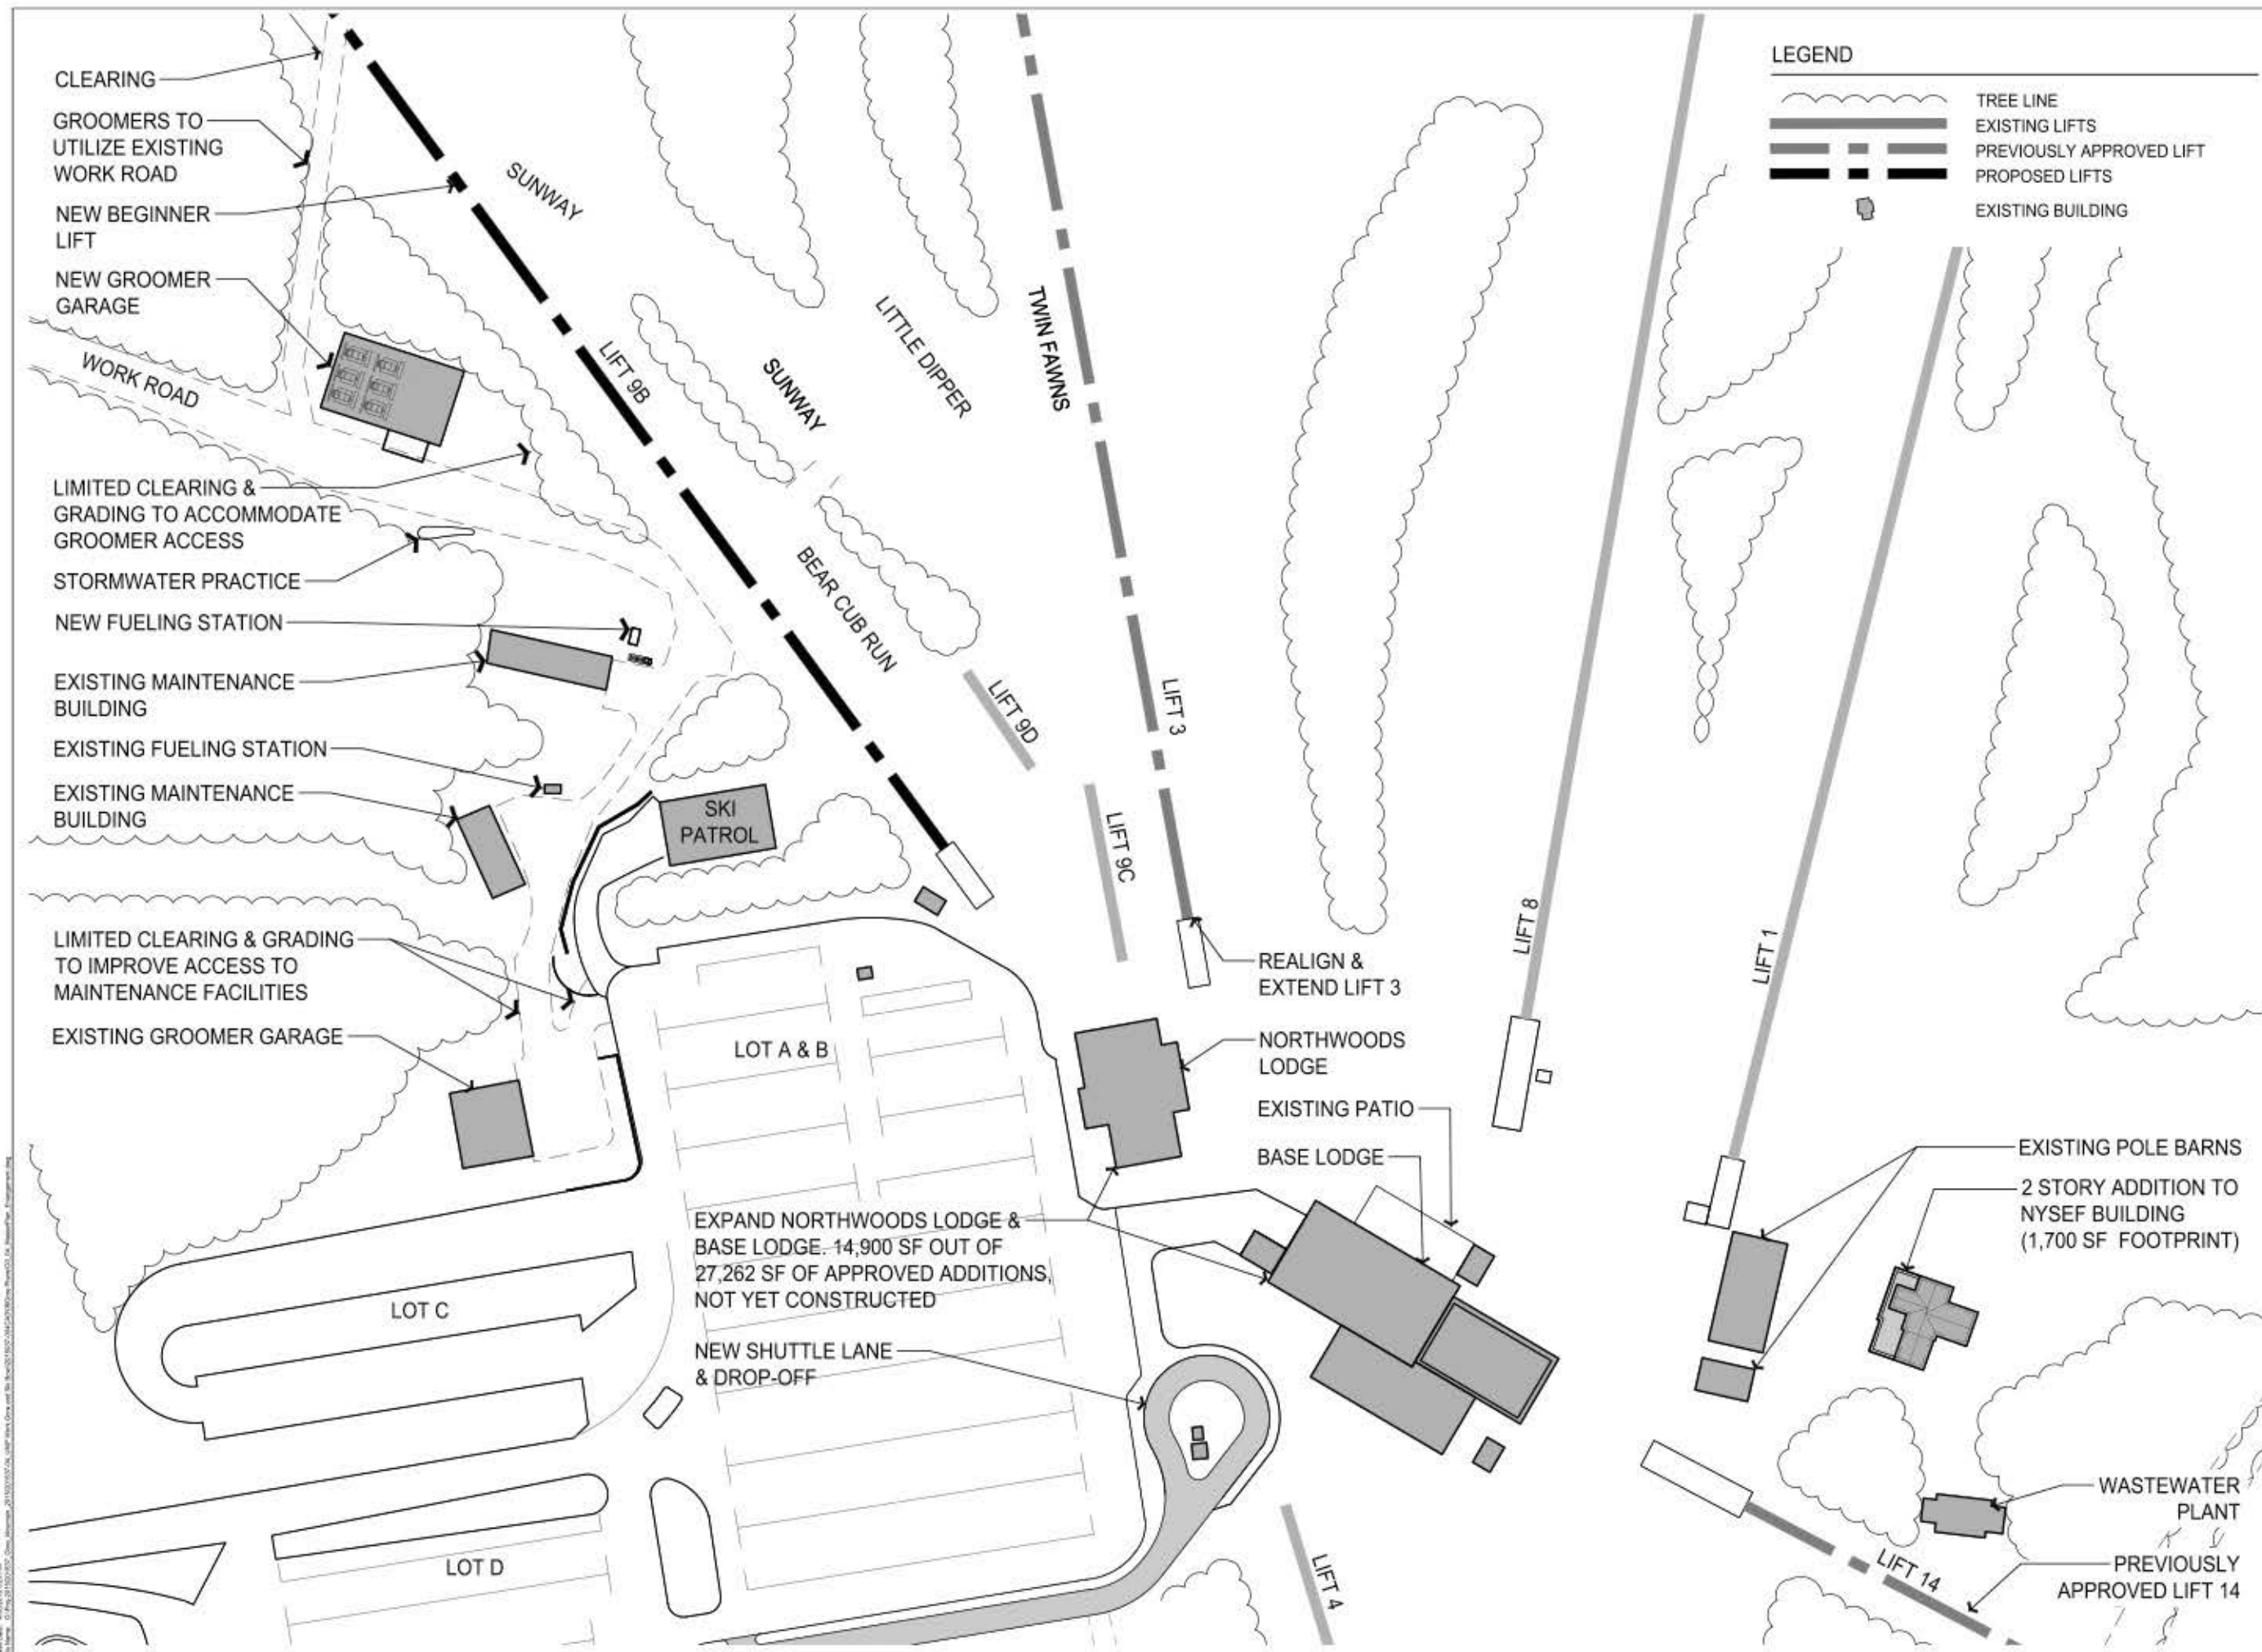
, Previously Approved Actions, Not Yet Constructed (North).
